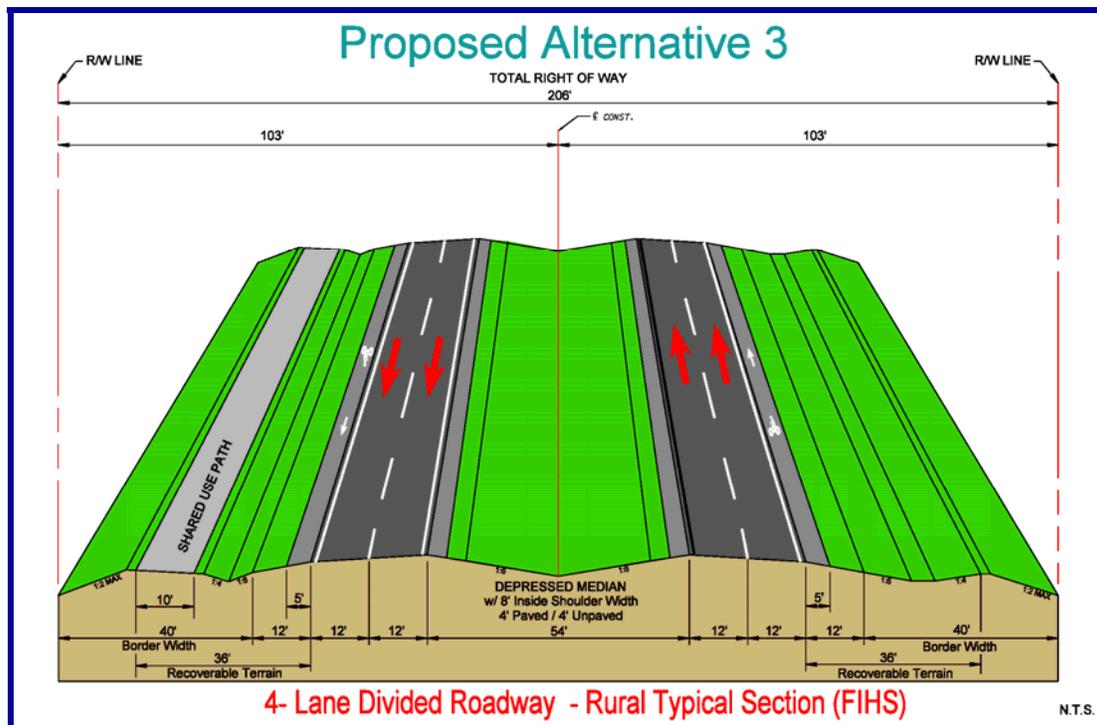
Alternative 3 Proposed Typical Roadway Section (Rural)
